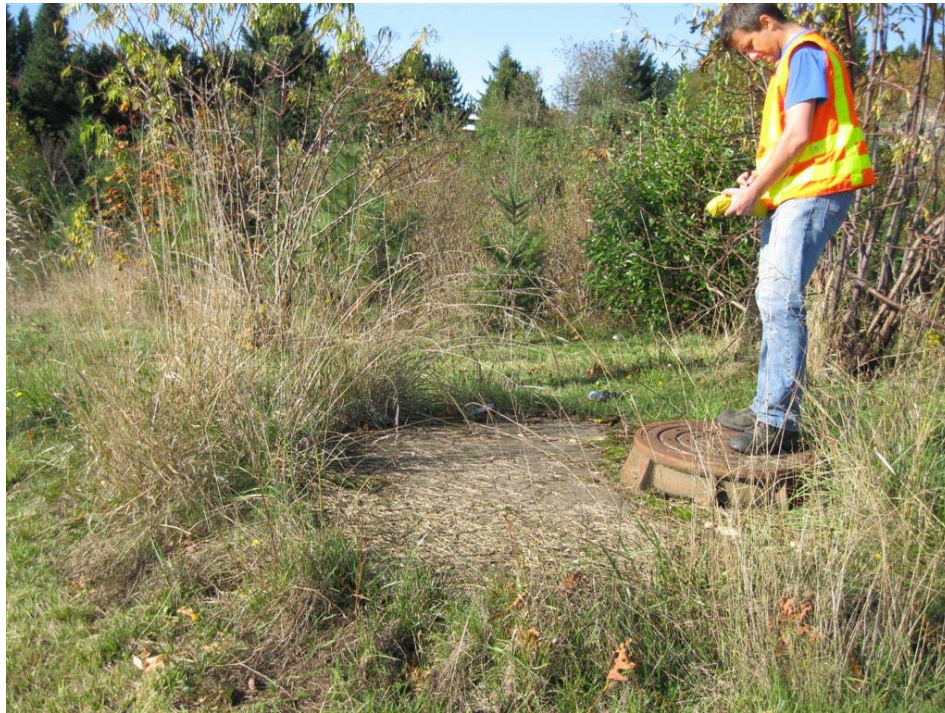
Pond/Swale Combo facility looking north toward pollution control manhole and facility inlet.
